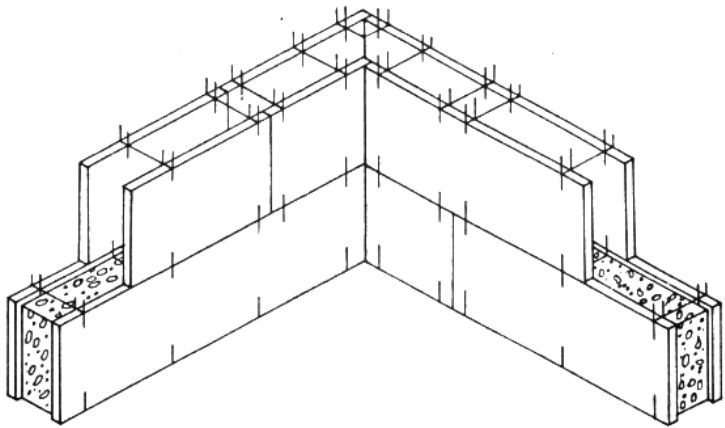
| Velox board wall construction (Beneš & Bartoš, 1980)
